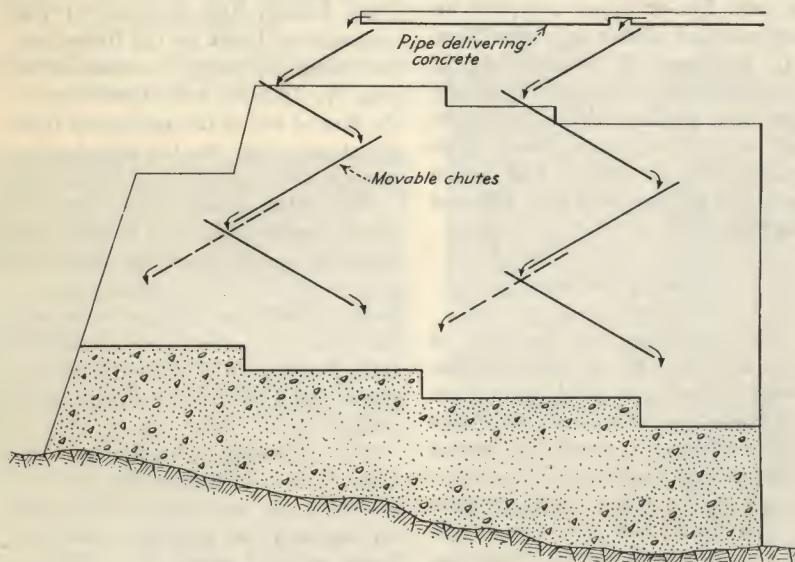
Chute arrangement for distributing pumped concrete inside the pier forms.
